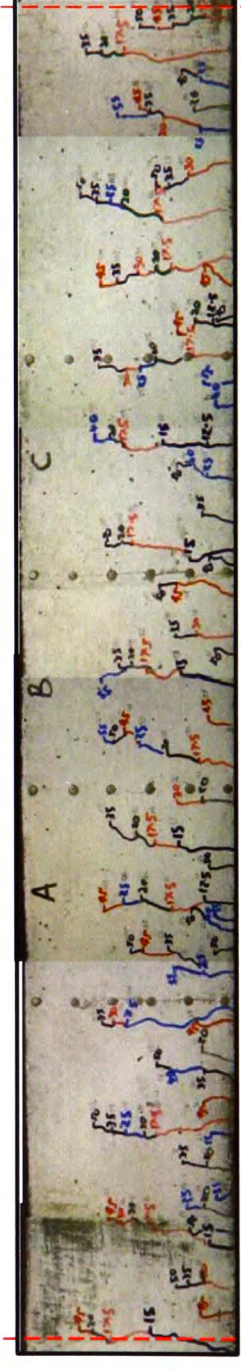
(c) – Photograph of crack pattern for 8CF3 within constant moment zone at failure
